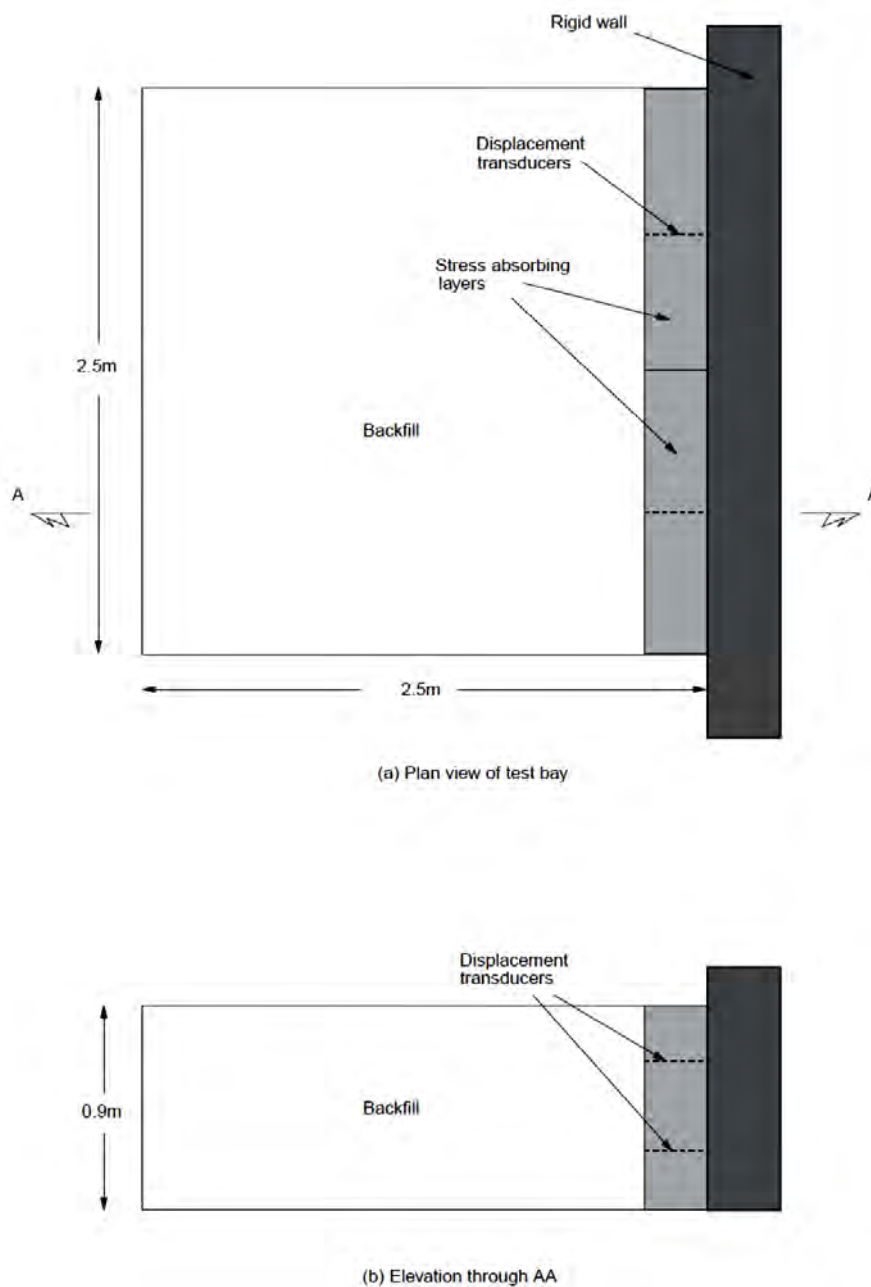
Plan and elevation of the experimental test bay (Carder et al 2002)
